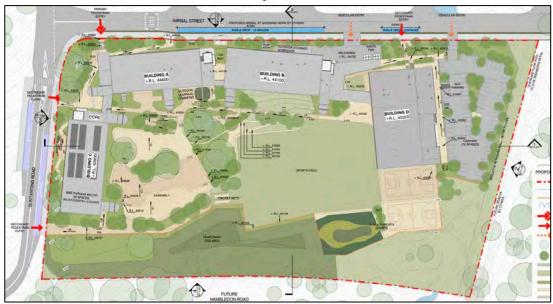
The proposed layout (Source: Architectural Plan Sett by Djrd Architects Issue 9 dated 20/01/2025).
